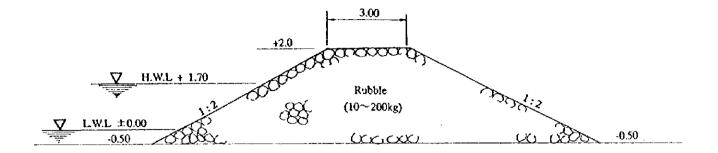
Typical Cross Section of Training Wall (Rubble Mound)
